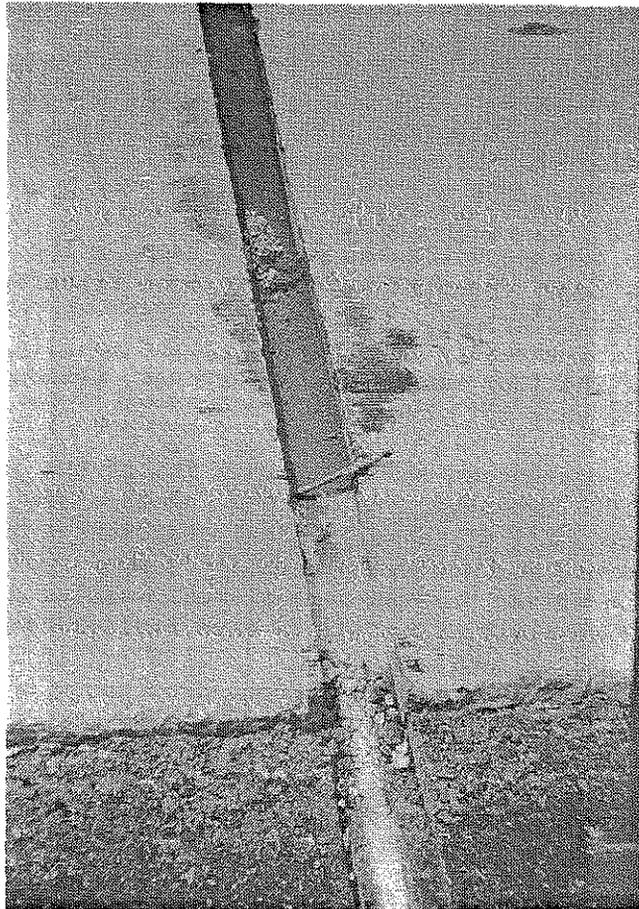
Photo of Typical Pressure Relief Joint in Sample Unit 1
